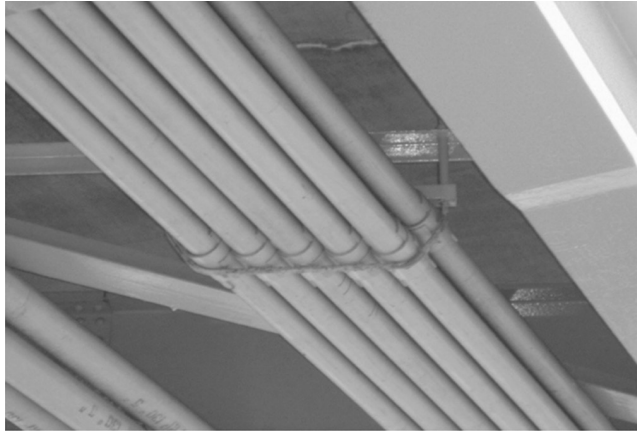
Overview of joint use of a bridge's substructure.
